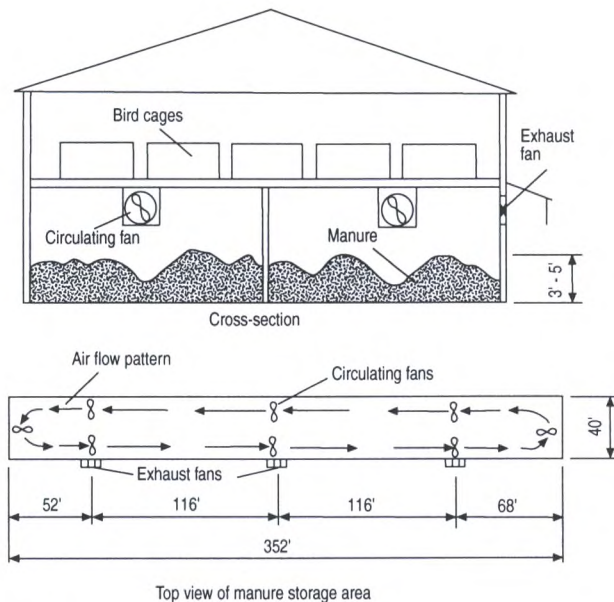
Ventilating the manure pit in a typical high-rise layer building (Source: *Livestock Waste Facilities Handbook, MWPS-18*)
